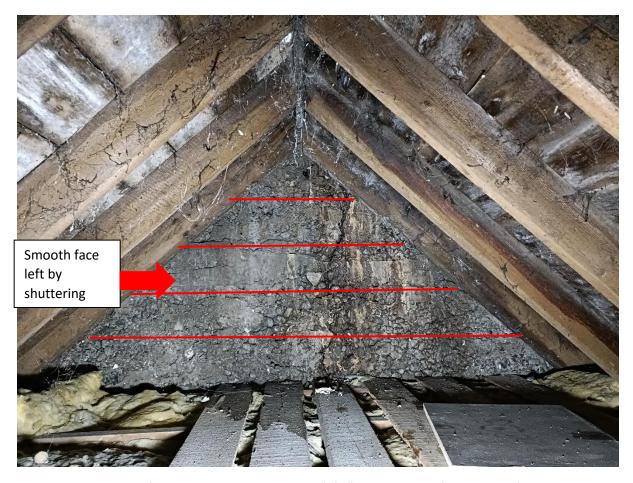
Evidence of concrete construction with "lifts" and evidence for the use of shuttering can be seen in the gable wall of the southern elevation.
